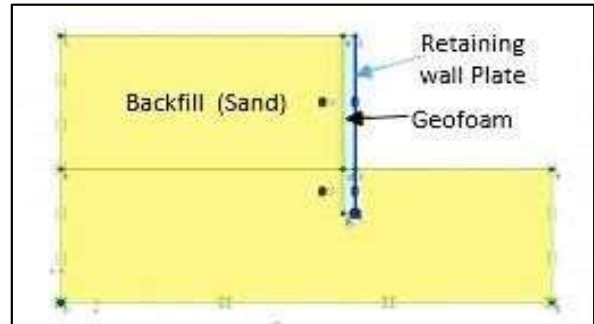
Retaining wall with geofam inclusion at interface of wall and backfill in static condition
